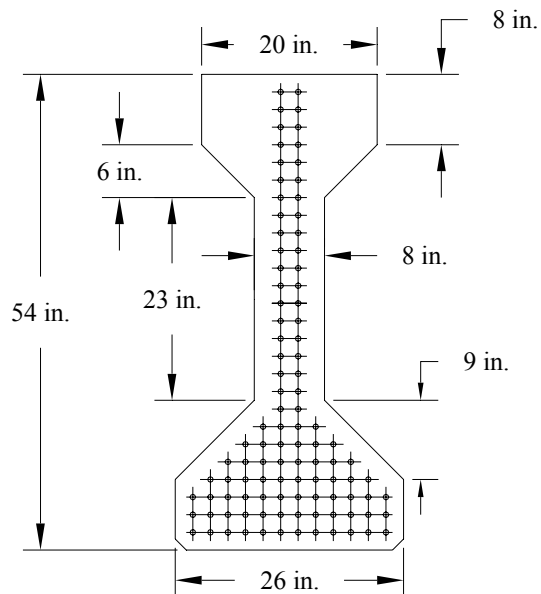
Section Geometry and Strand Pattern for AASHTO Type IV Girder (Adapted from TxDOT Bridge Design Manual [TxDOT 2001]).
